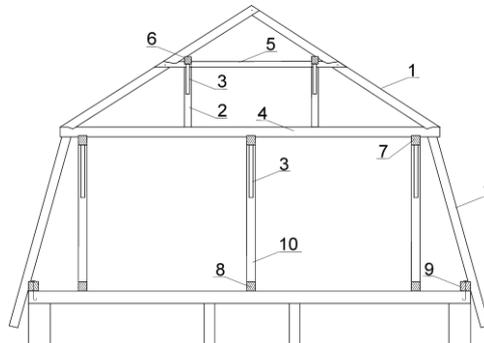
Mansard roof: 1 - rafter, 2 - upper post, 3 - angle brace, 4 - collar rafter, 5 - collar tie, 6, 7 - purlins, 8 - ground sill, 9 - plate, 10 - lower post
